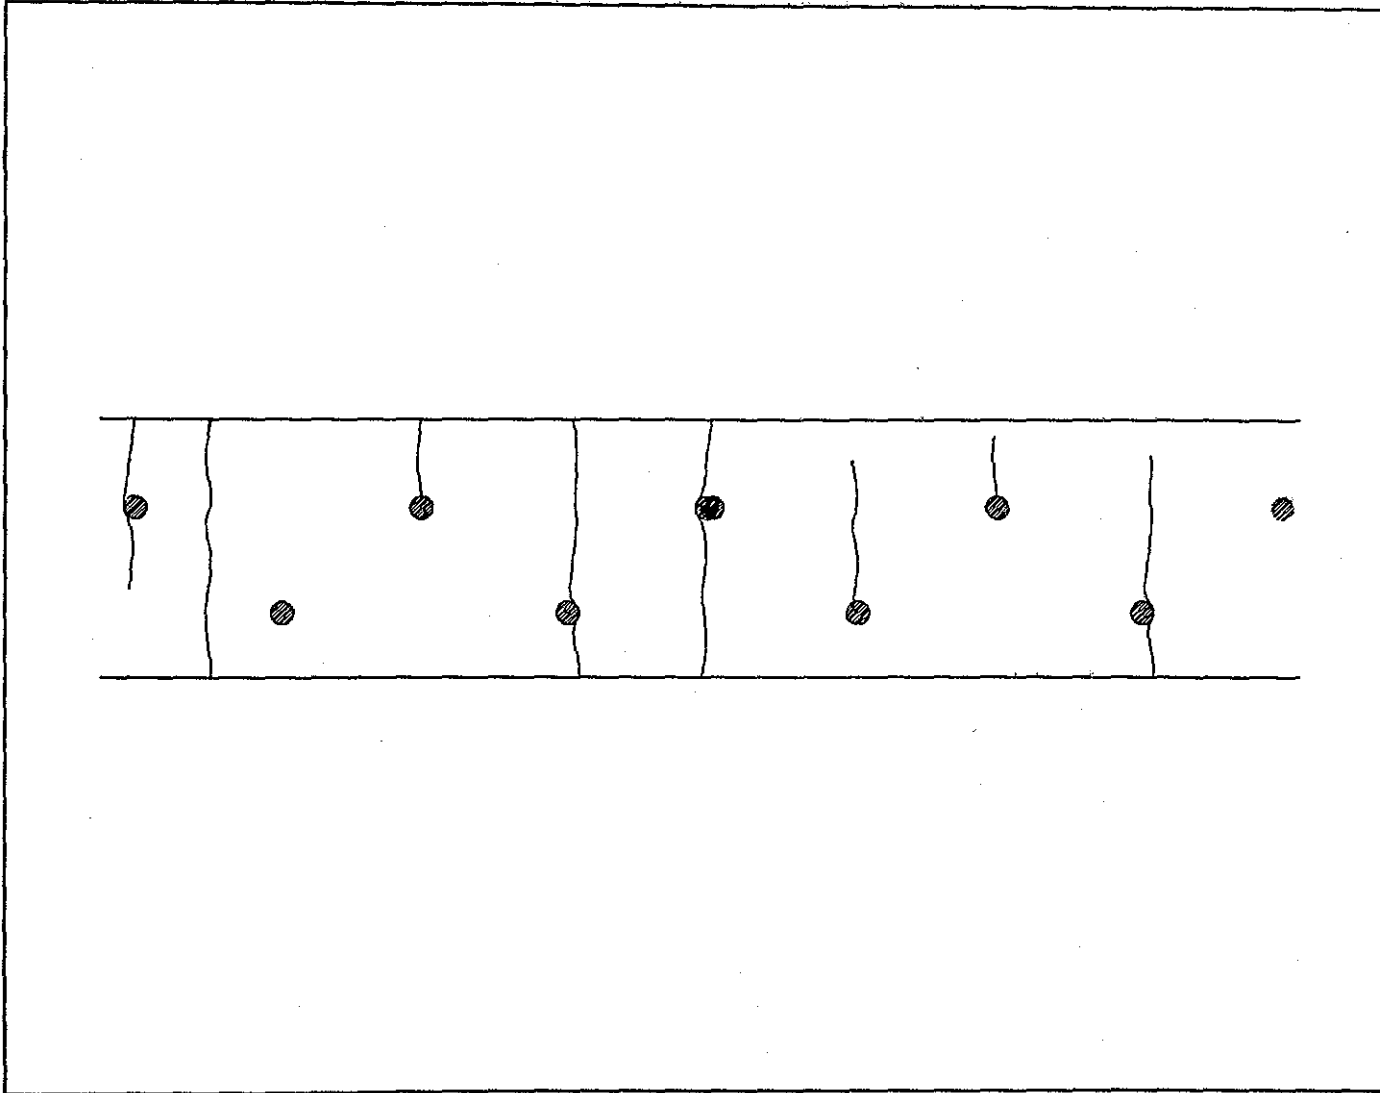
Cracking Patterns on the Pavement Edge.
